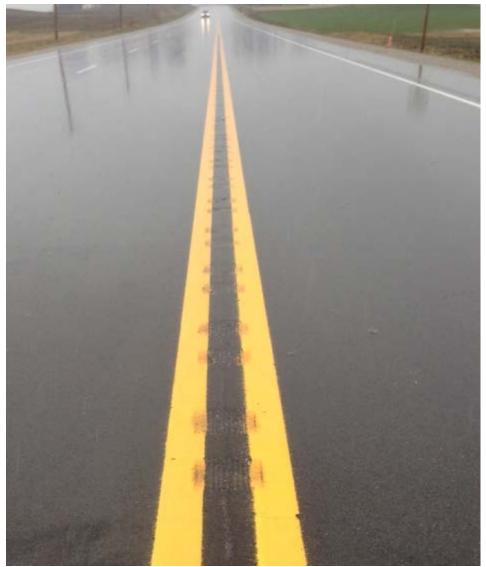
STH 26 longitudinal joint, photographed 3/31/16
